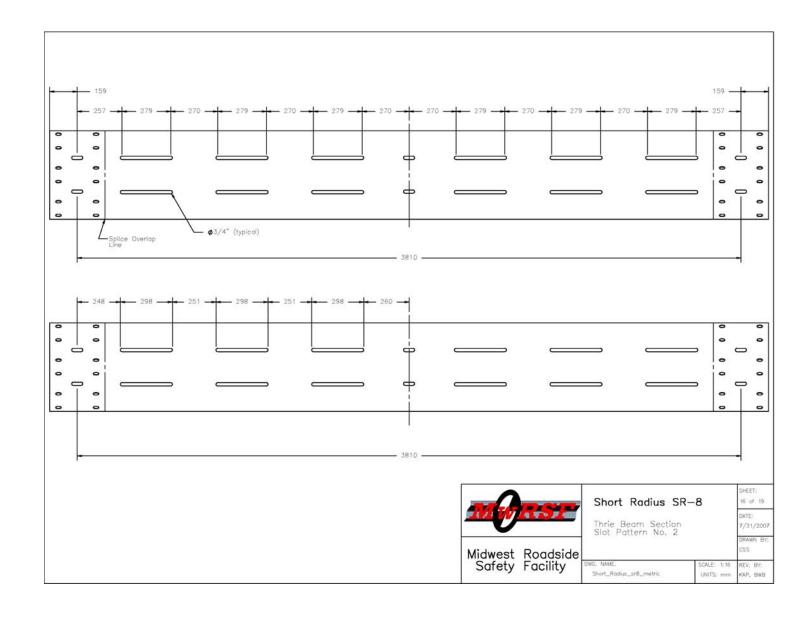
Thrie Beam Section Slot Pattern No. 2
